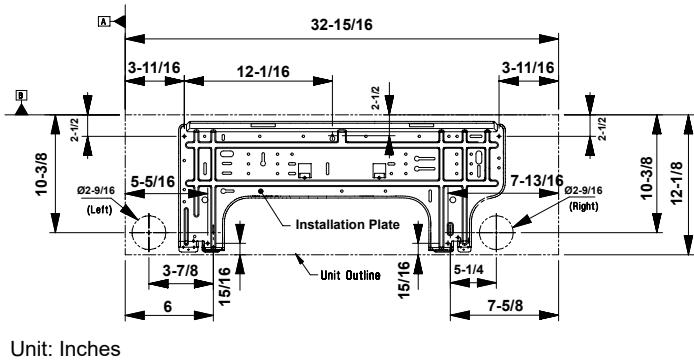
SKA Standard Frame Wall-Mounted Installation Plates.
